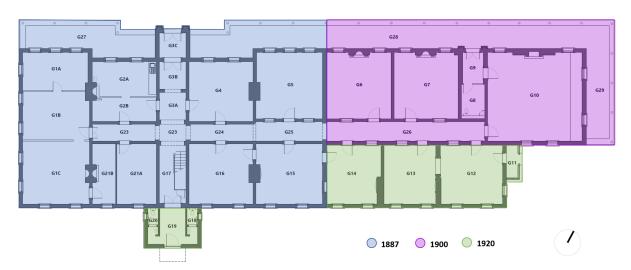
Phases of Construction: Ground Floor Plan. Source: Curio Projects, 2022.
